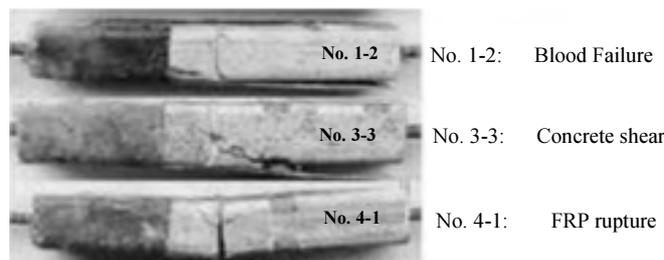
Bond specimens after loading (No 1-2: Bond Failure, No 3-3: Concrete Shear, No 4-1: FRP Rupture)
